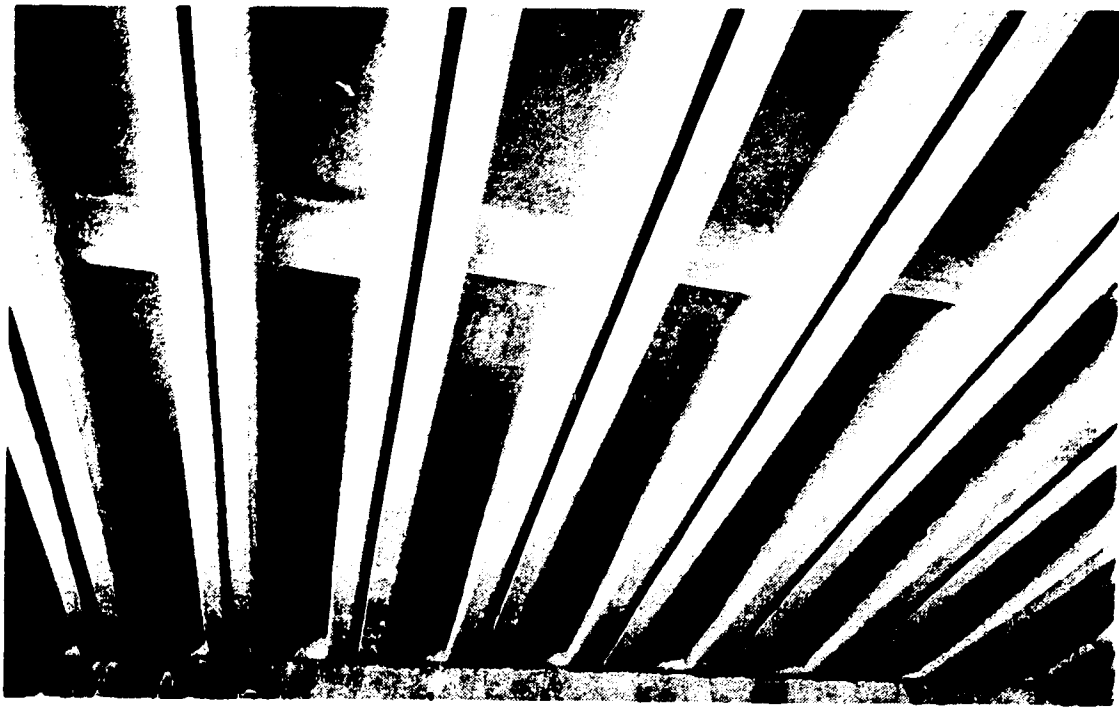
Underside of superstructure of typical Type 'E' girder bridge
